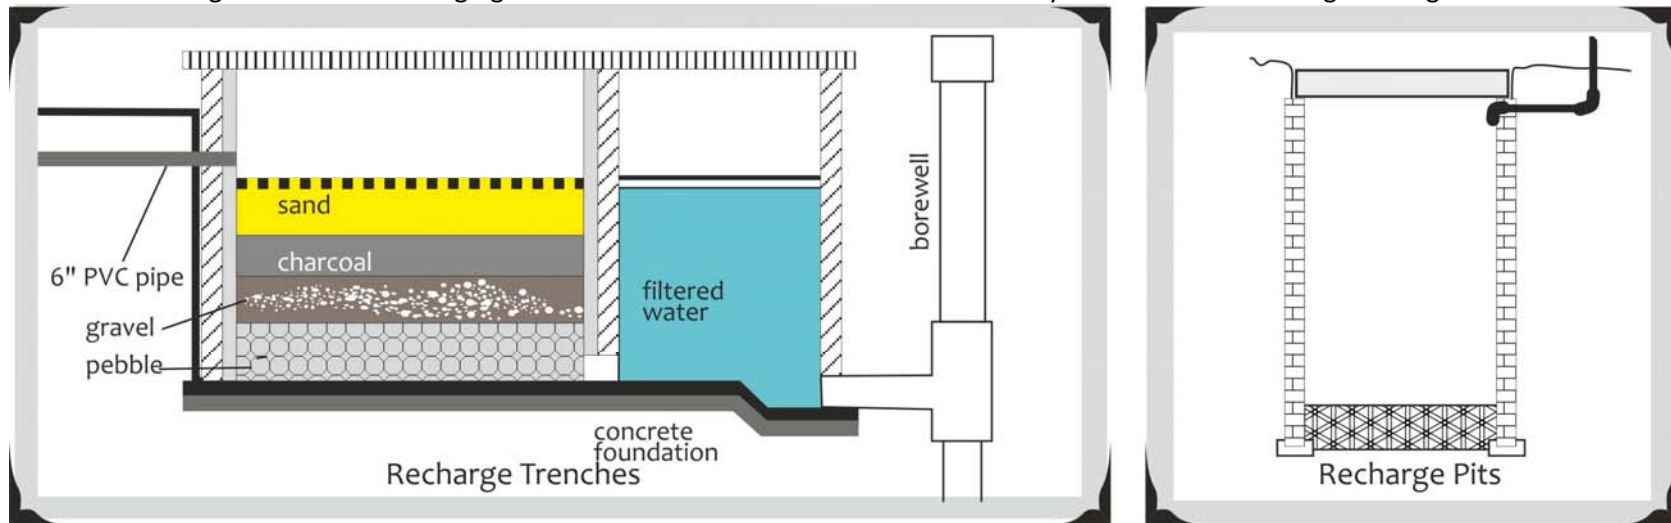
| The collected rain or stormwater could be used for recharging the groundwater through recharge trenches and pits.
